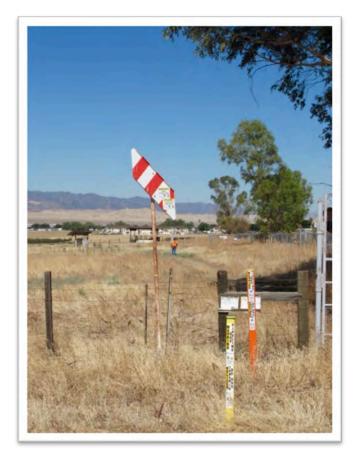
Right of Way looking west at intersection of Hydril and Avenue 36 near Avenal, CA
